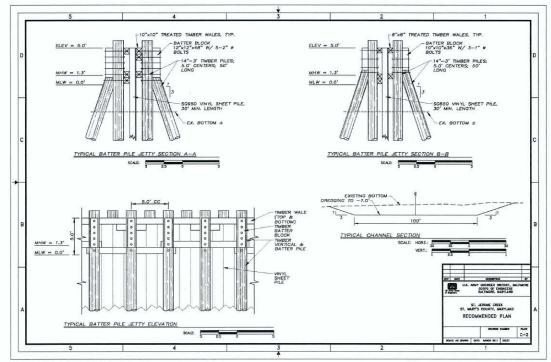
Batter Pile/Vinyl Sheet Pile Jetty
